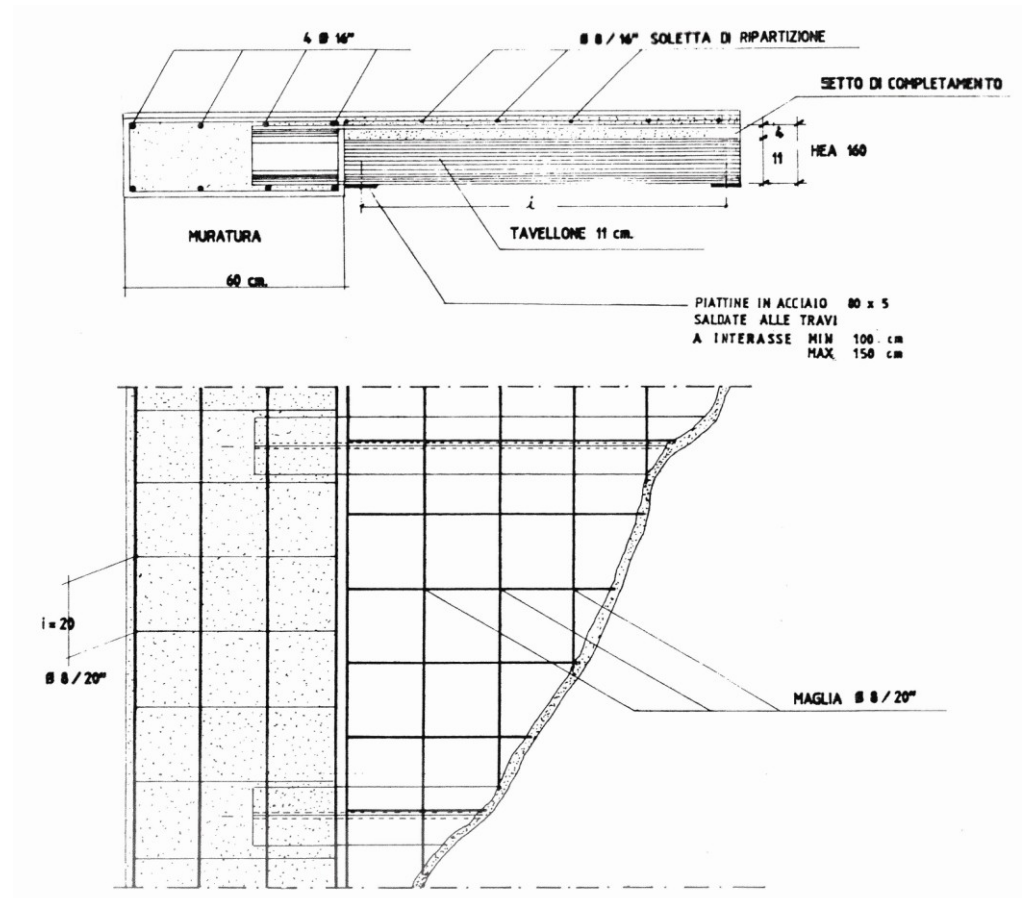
Executive design of new floor in steel beams and brick (by Ente Ville Vesuviane Archive)
